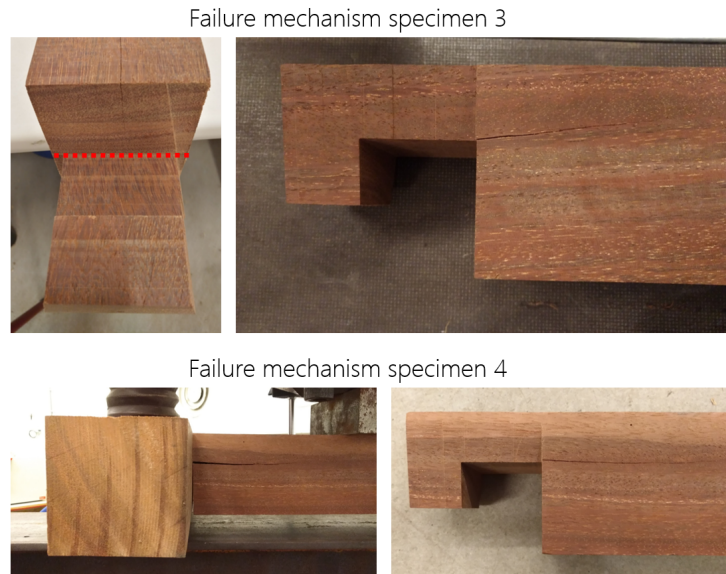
Failure mechanism of the specimens with sharp edges (specimen 3 and 4)
